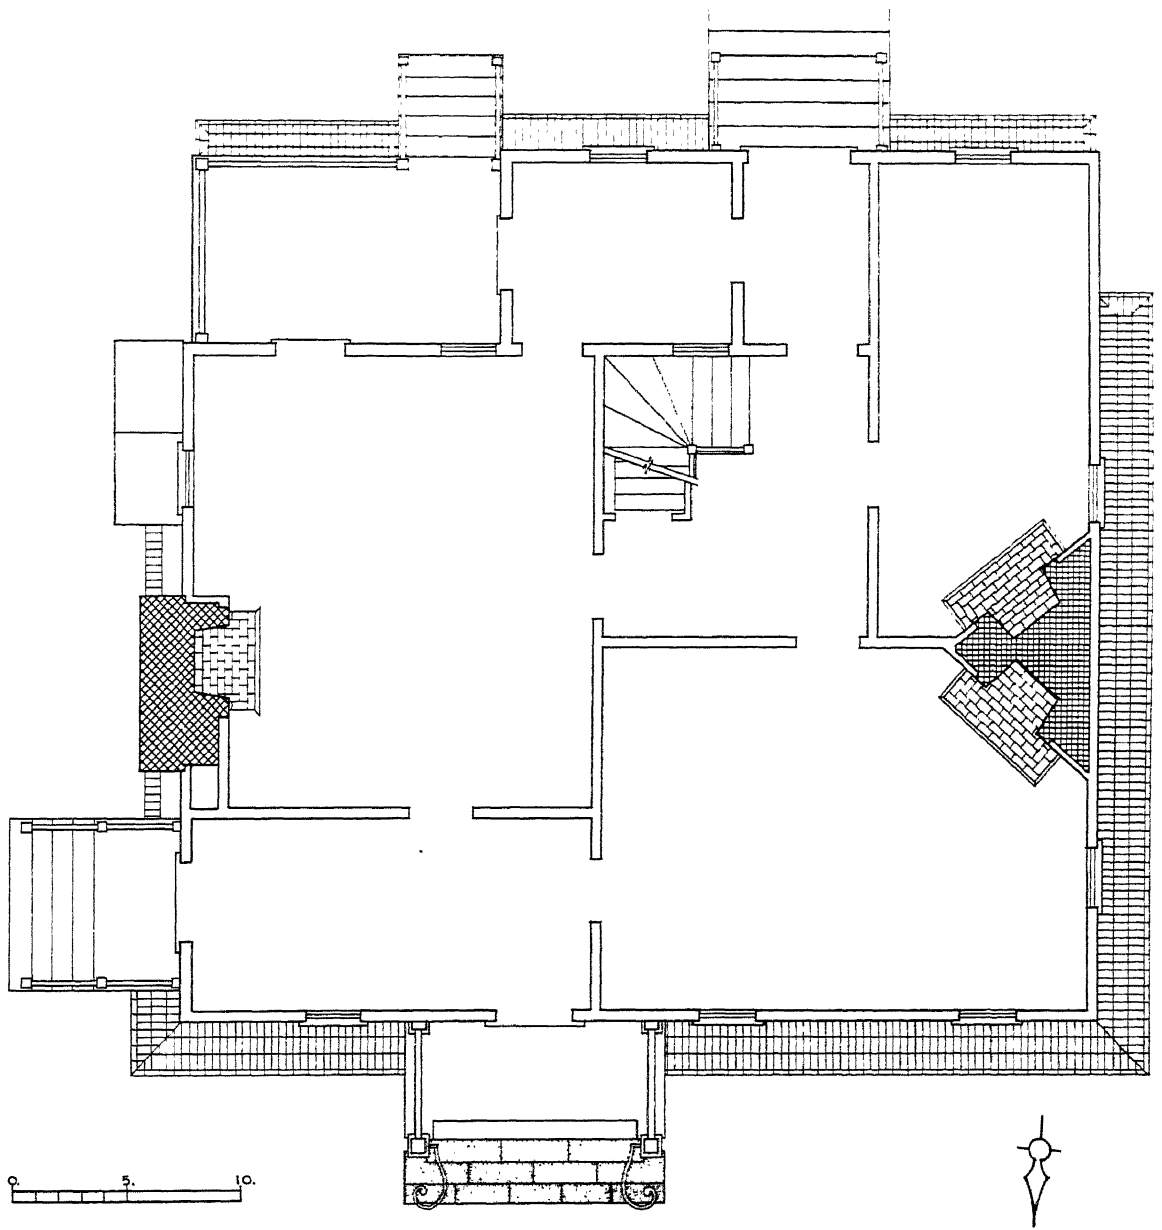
THE TALIAFERRO-COLE HOUSE. Plan.
